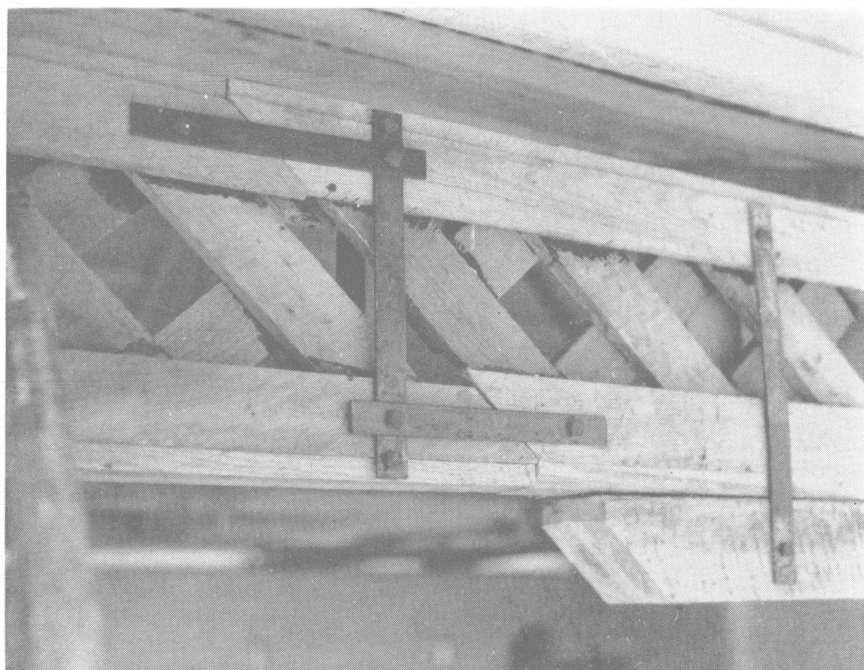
Method of splicing continuous lattice beams at contraflexure points with bolts and steel straps.
